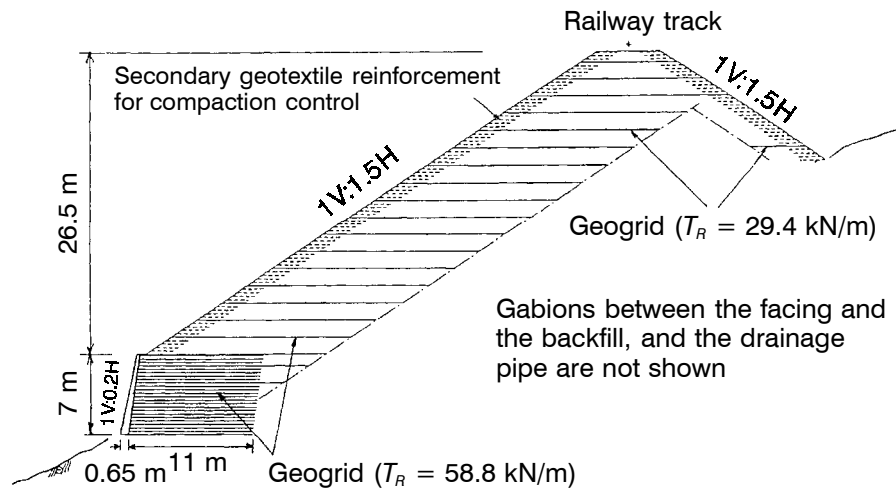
Typical cross section of the reconstructed railway embankment at the Mount Aso site (the Ho-hi Line, Location 8, Figure 3).
